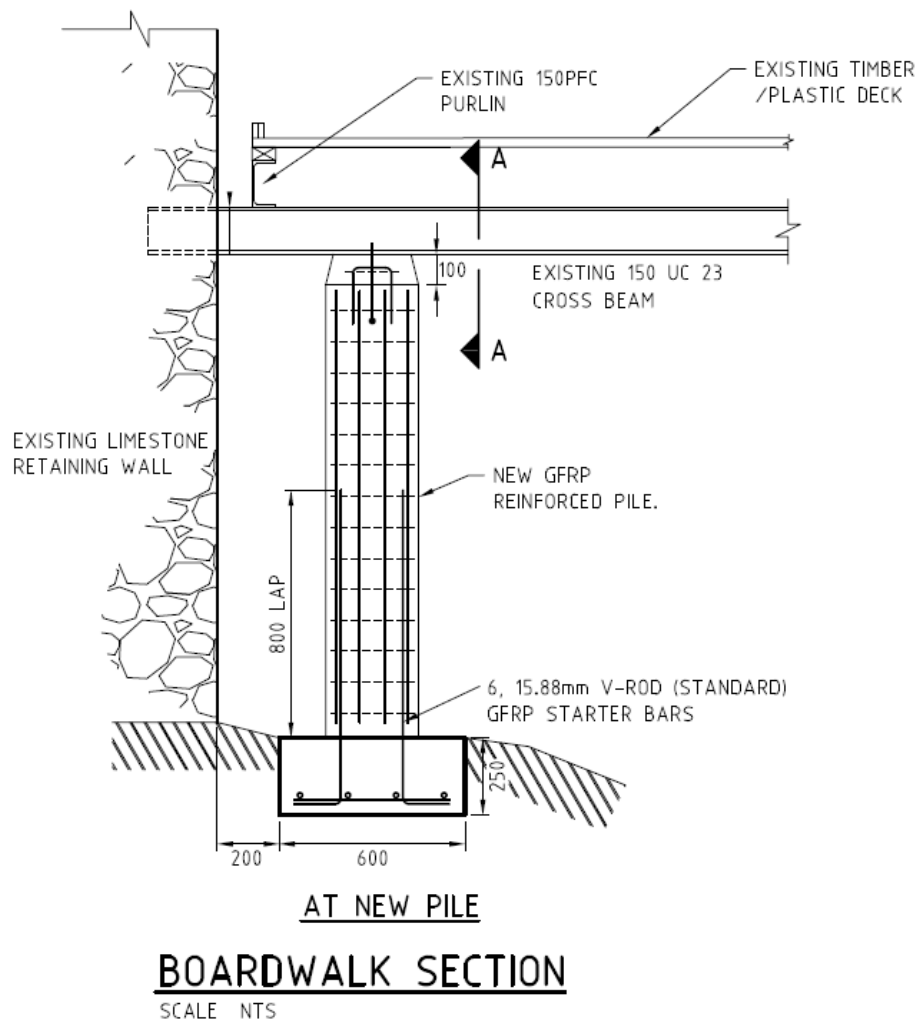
Steel Cross Beam Embedded in Retaining Wall.
